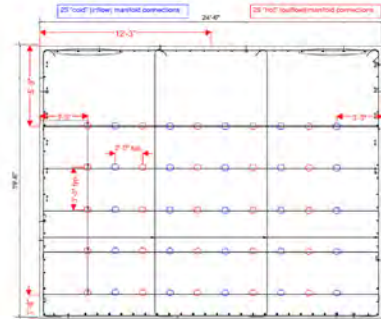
Pier 5 Crossbeam Placement 1 Rebar-mounted Cooling Pipes Layout, Section View
